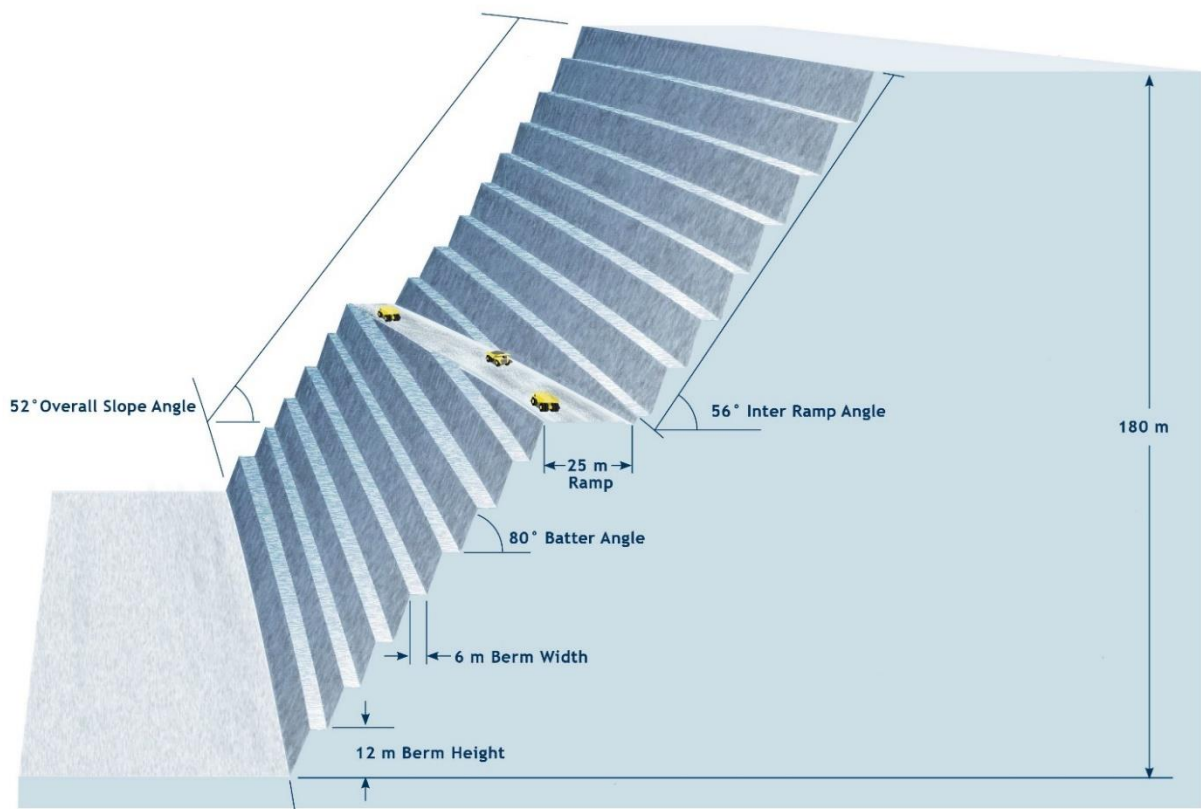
Representation of the Piedmont pit wall design based on wall design configuration assumptions
